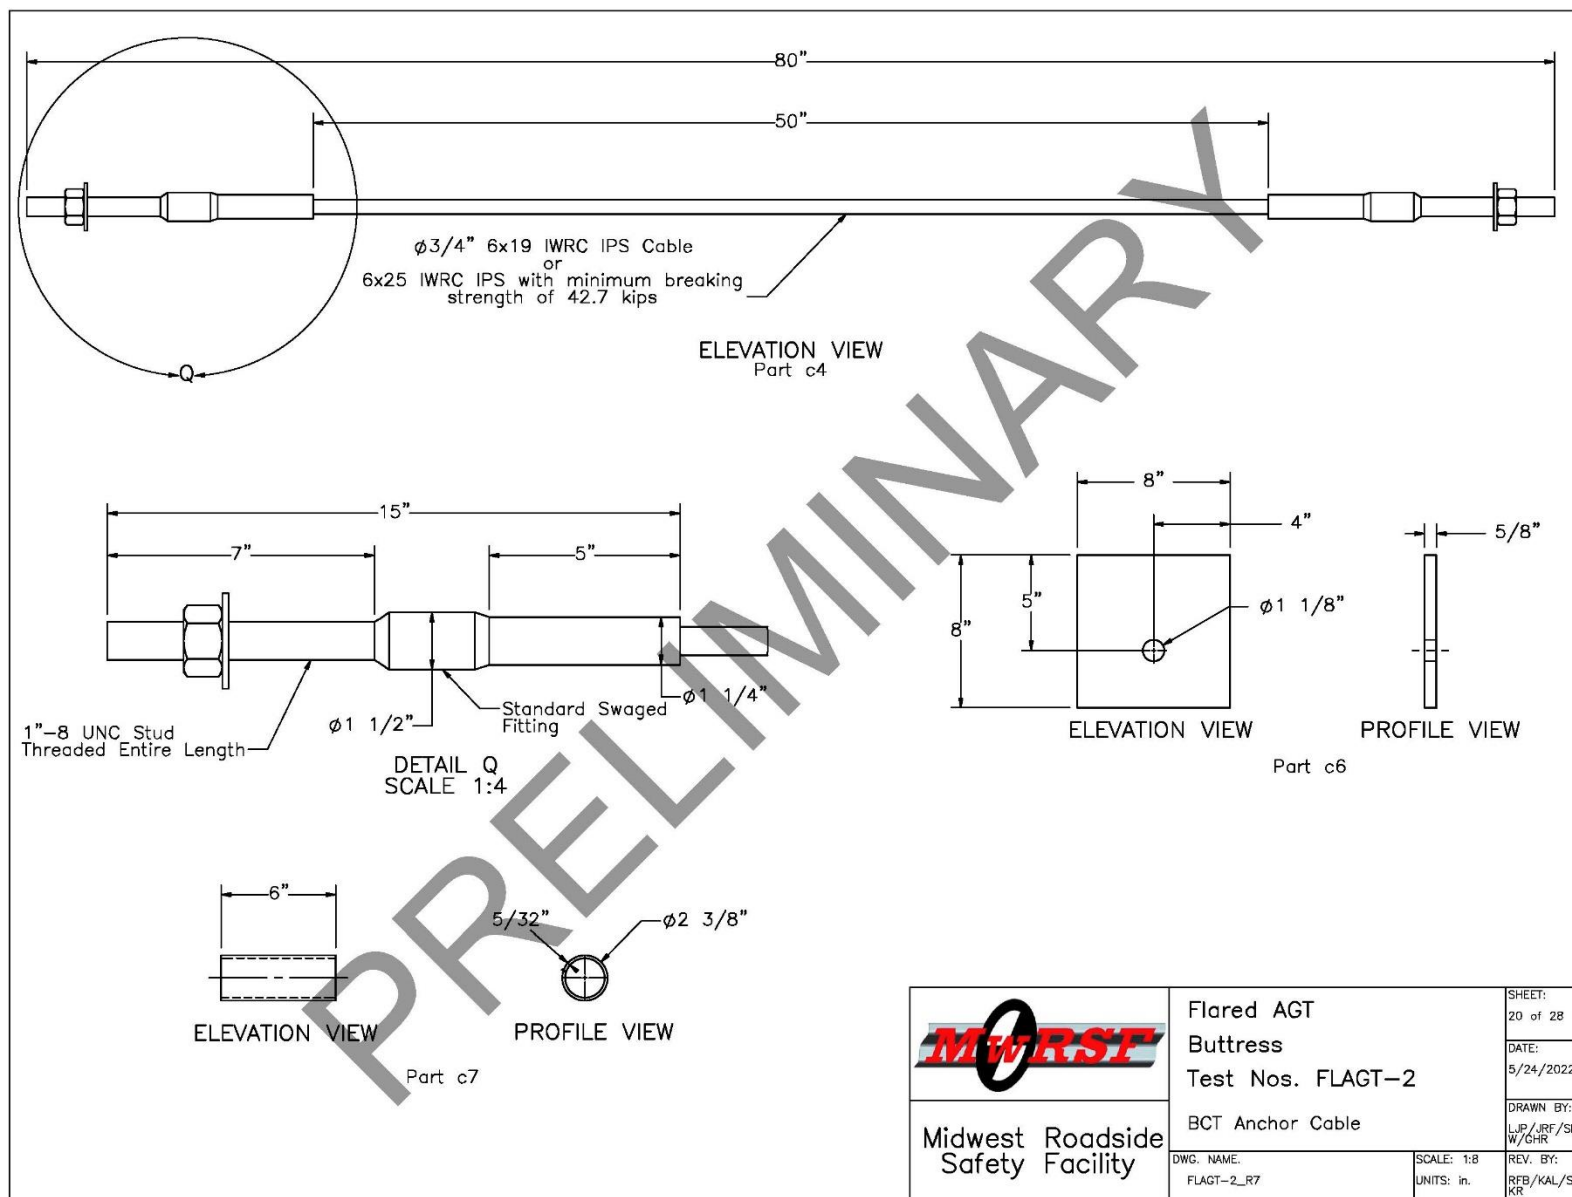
BCT Anchor Cable, Test No. FLAGT-2
